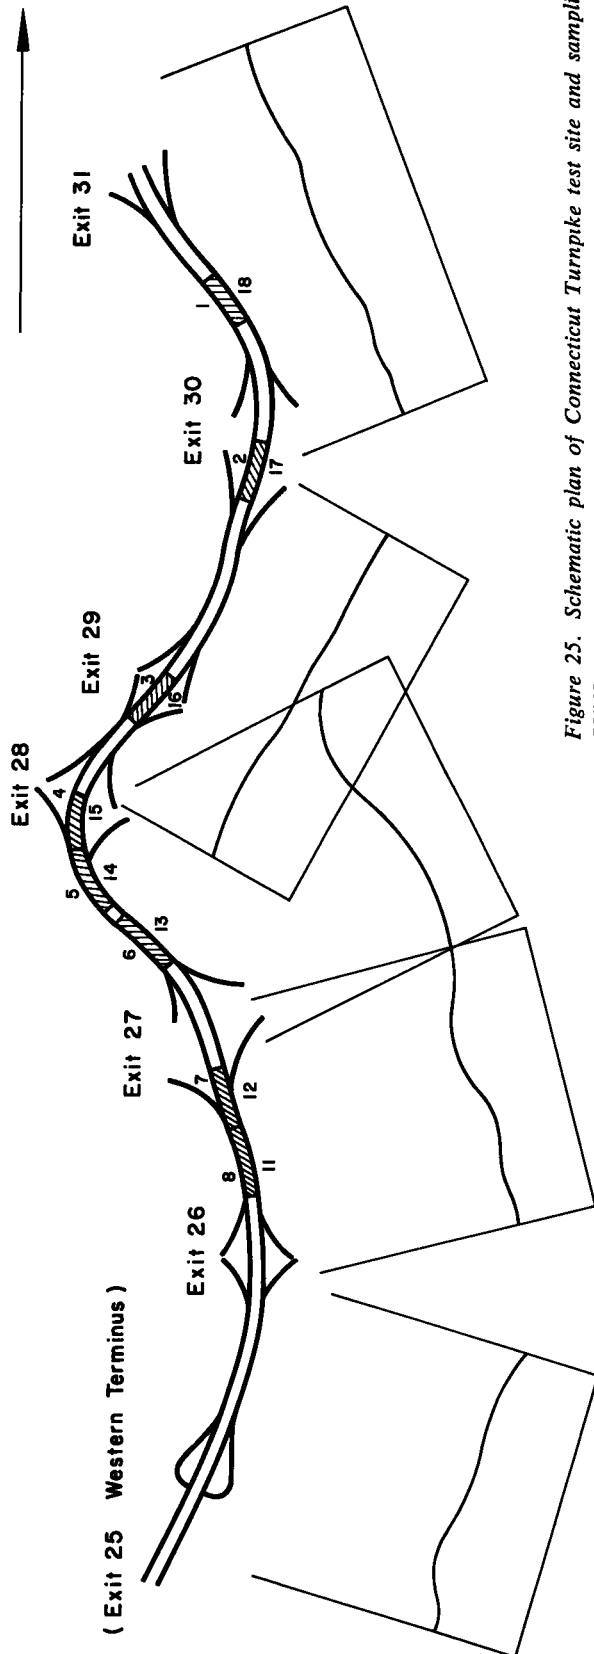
Schematic plan of Connecticut Turnpike test site and sampling zones.
